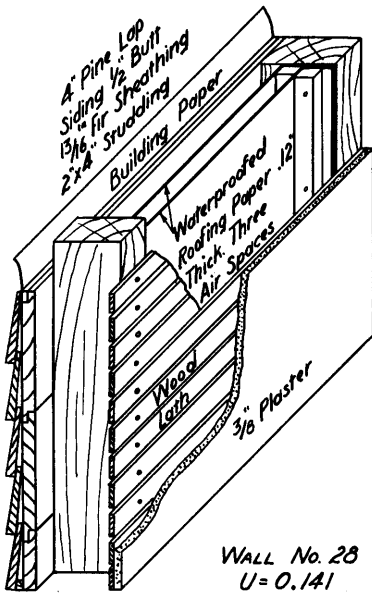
SECTIONAL VIEWS OF TEST WALLS
